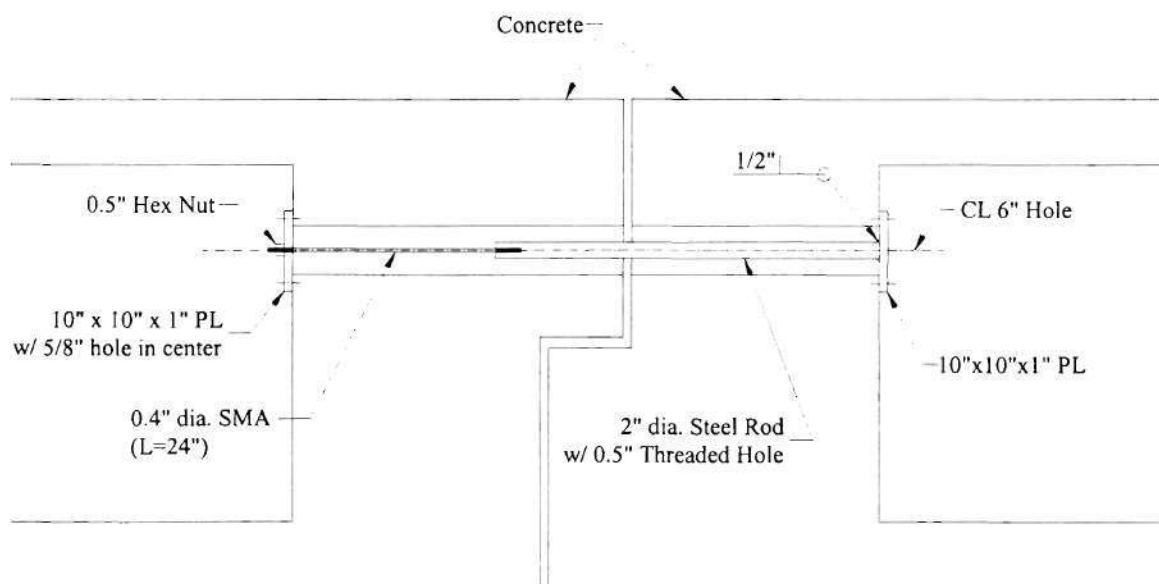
SMA Restrainer Connection on a Multi-Frame Bridge
